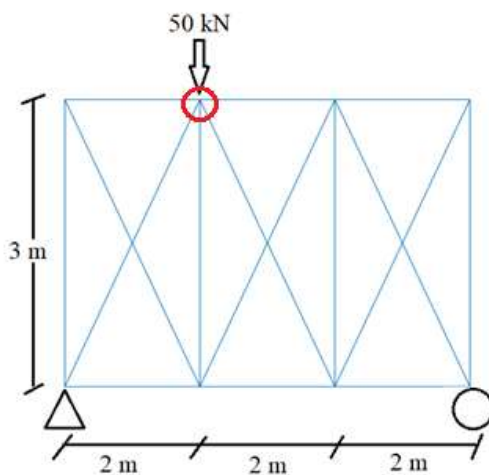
Ground Structure of Sixteen Elements Truss Subjected to First Load Case
